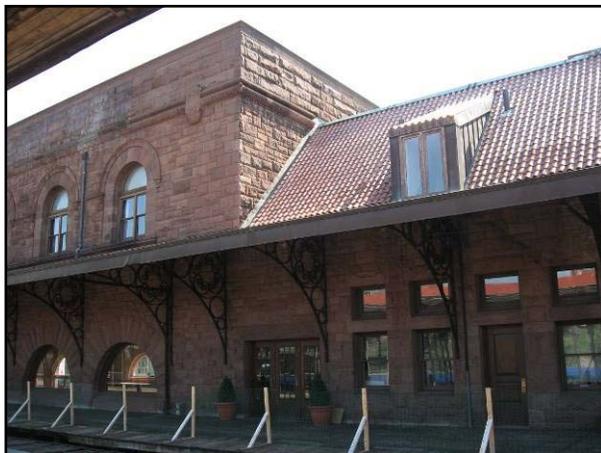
West Face of Union Station (Note staining of Brownstone bearing wall below roof line, above windows)
